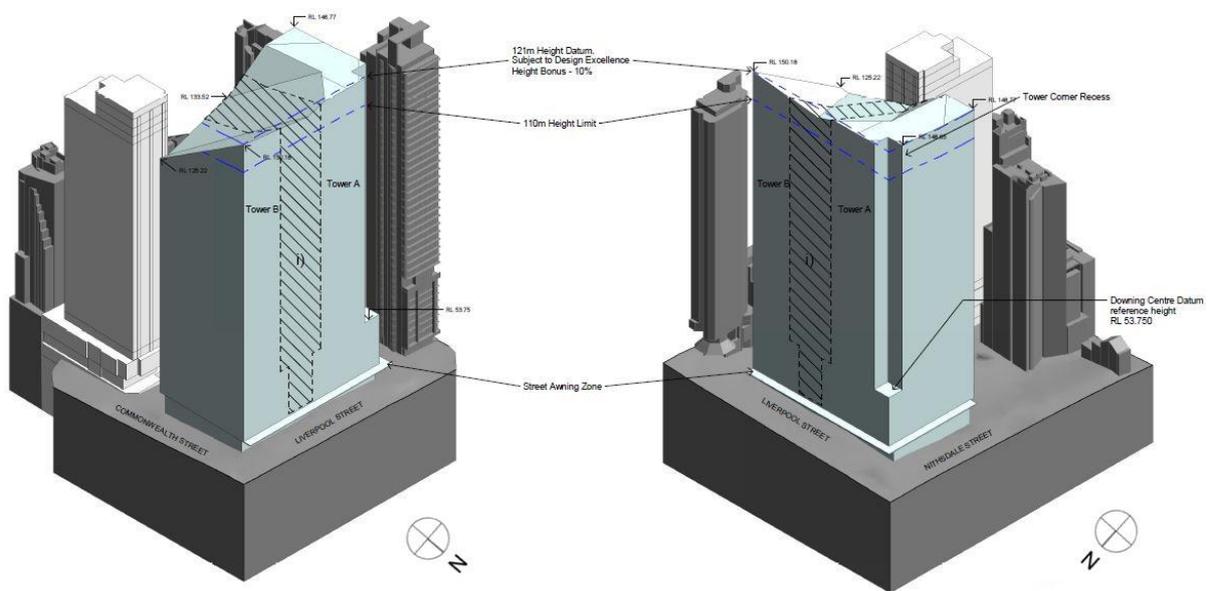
Envelope axonometric views, looking south-west (left) and south-east (right)
